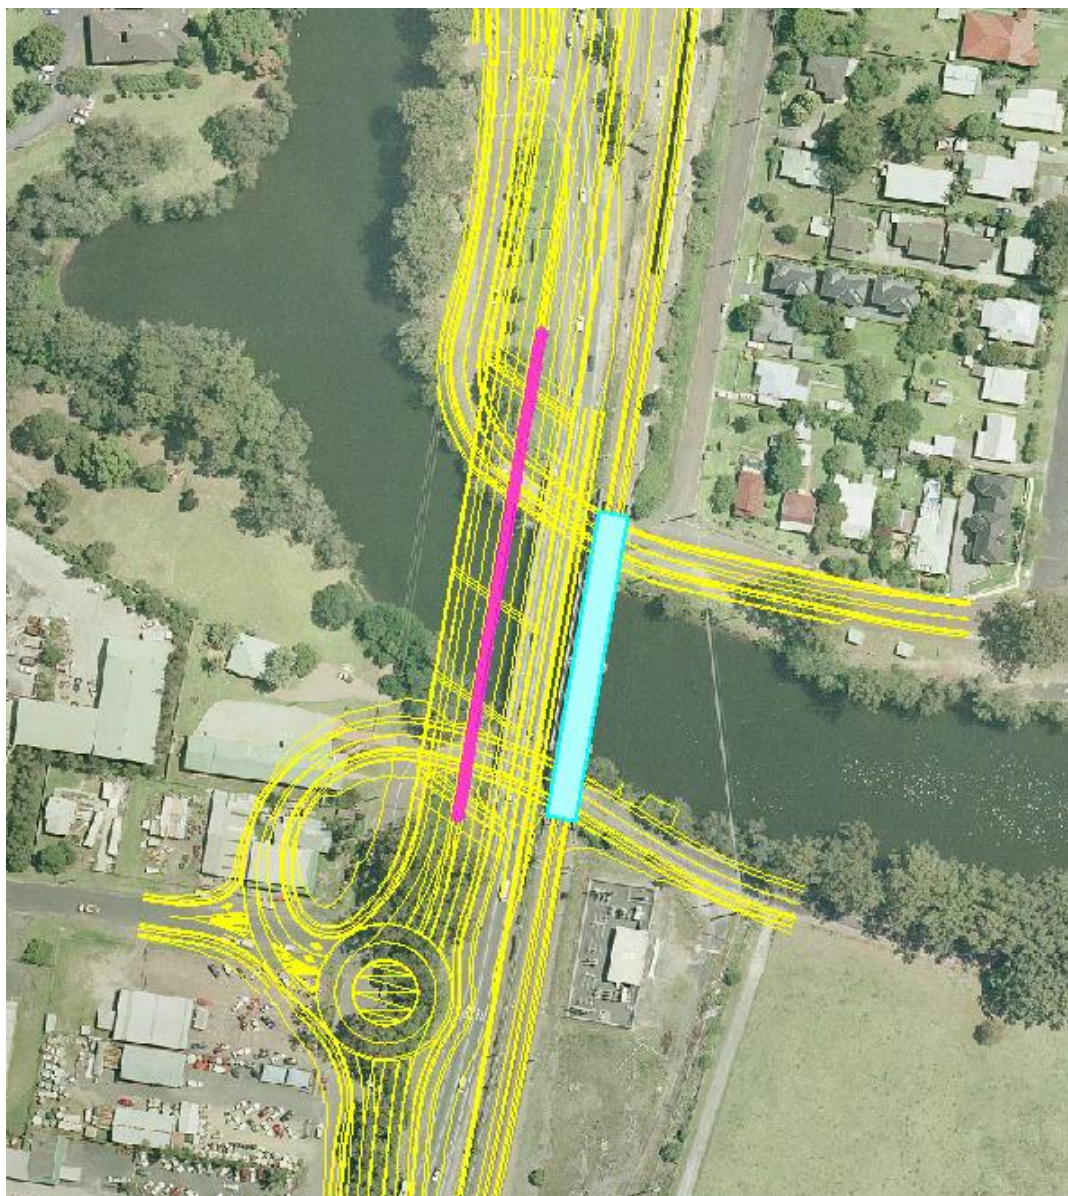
TUFLOW 2d flow constriction bridge lines and polygons for design (magenta) and existing (cyan) bridges over Wyong River
